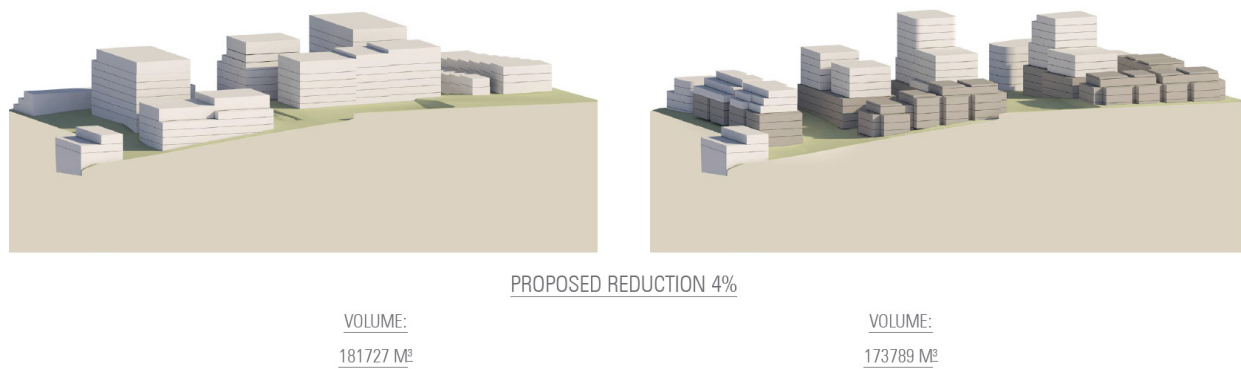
Comparative assessment of building volume under approved (left) and proposed (right) master plans
